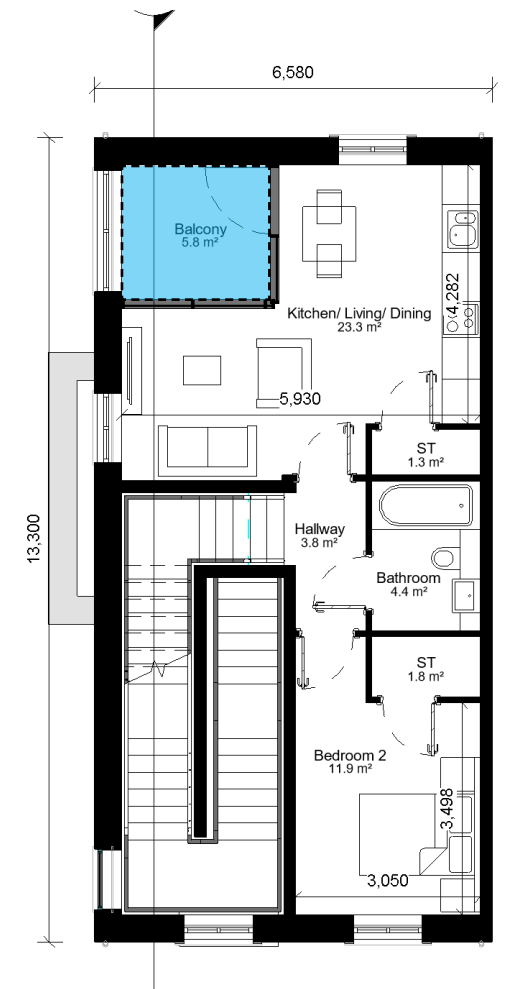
Proposed 1 Bedroom Apt Layout - First Floor Level - HT-10
